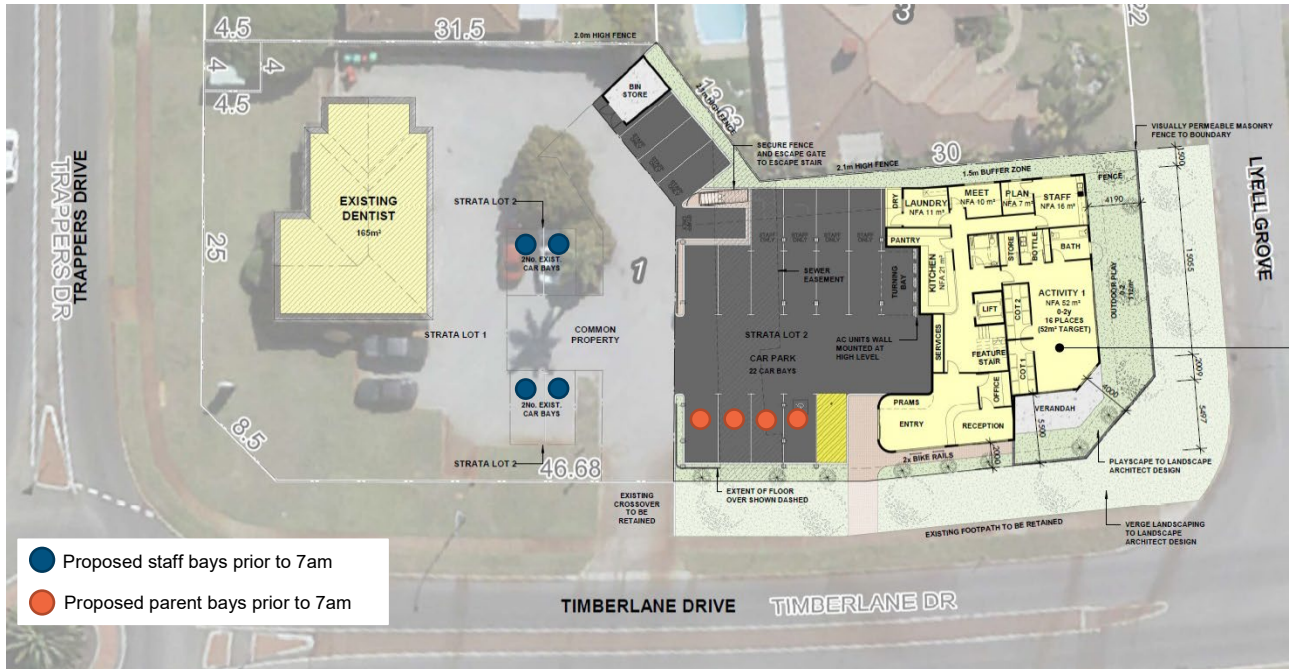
Parking Arrangement Previously Presented to Metro Outer JDAP
